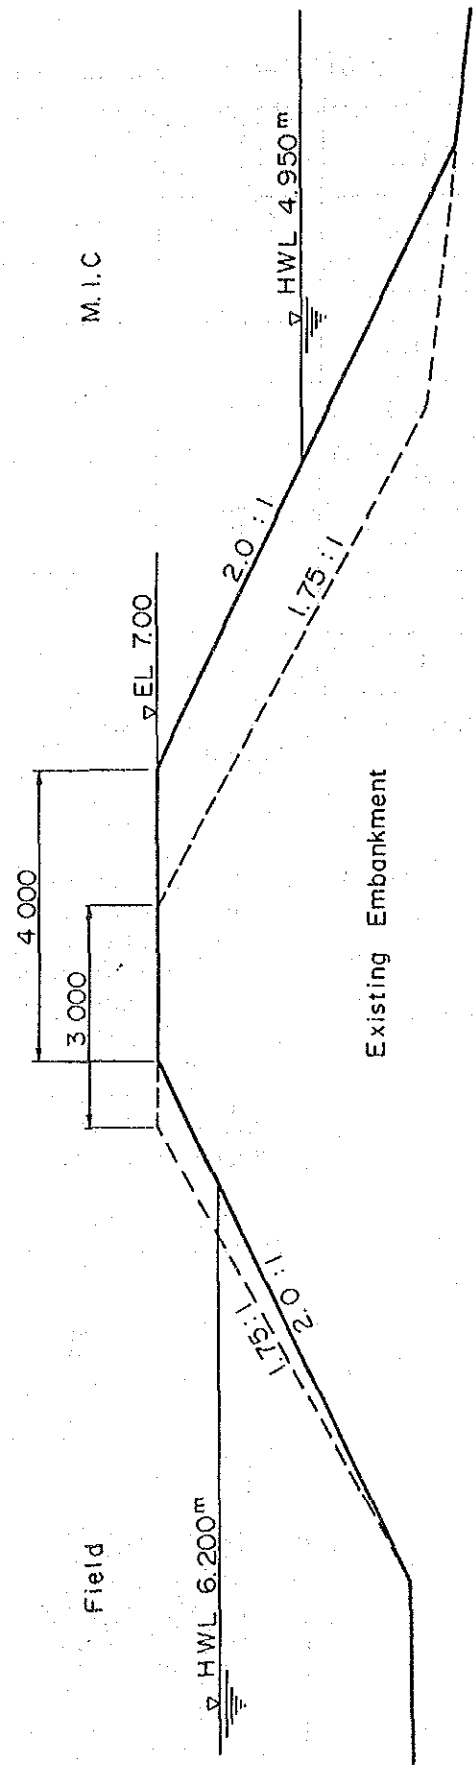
Typical Cross Section of Main Irrigation Canal Embankment
